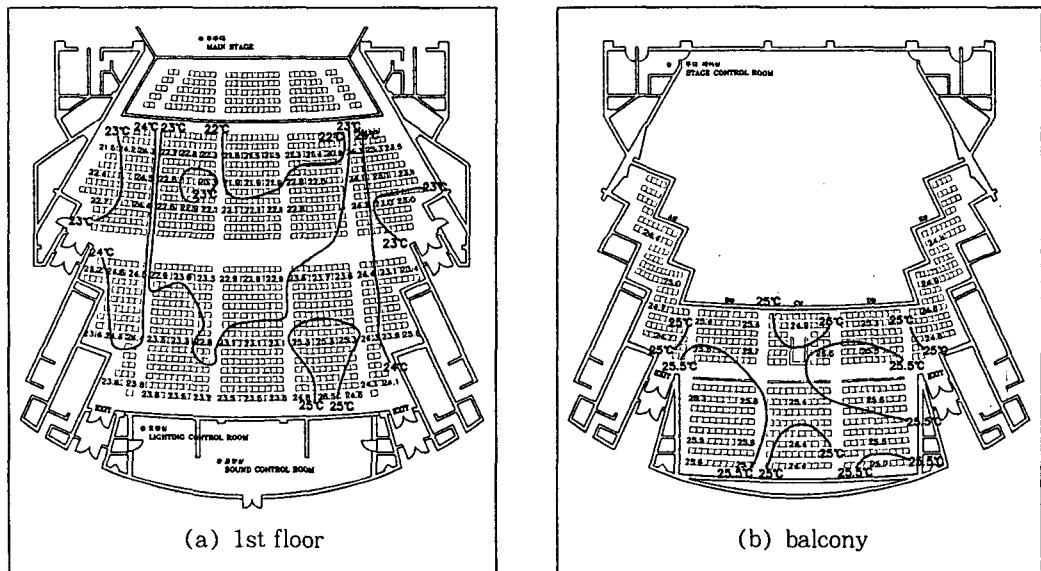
Isotherms of 1st floor and balcony for KBS open hall at the 1.1m over floor
